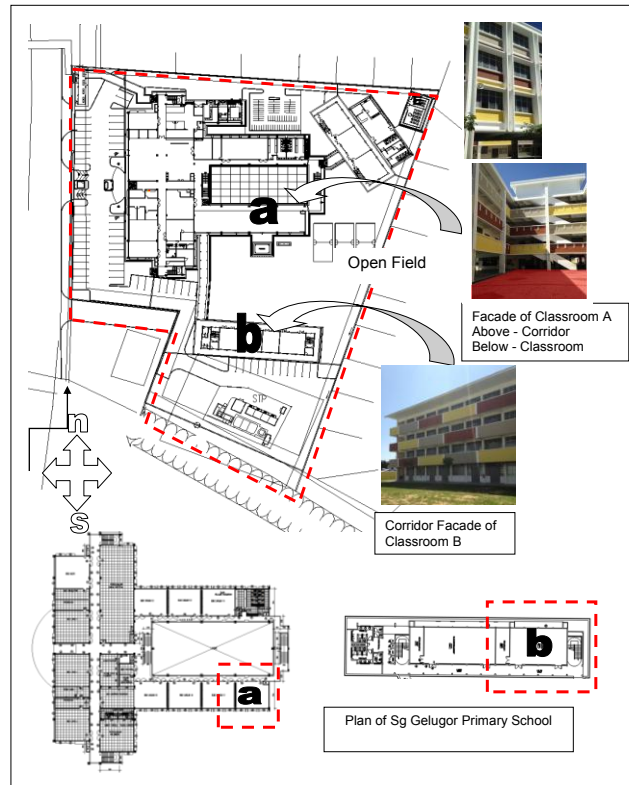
Plans and Photos of Sekolah Kebangsaan Sungai Gelugor
